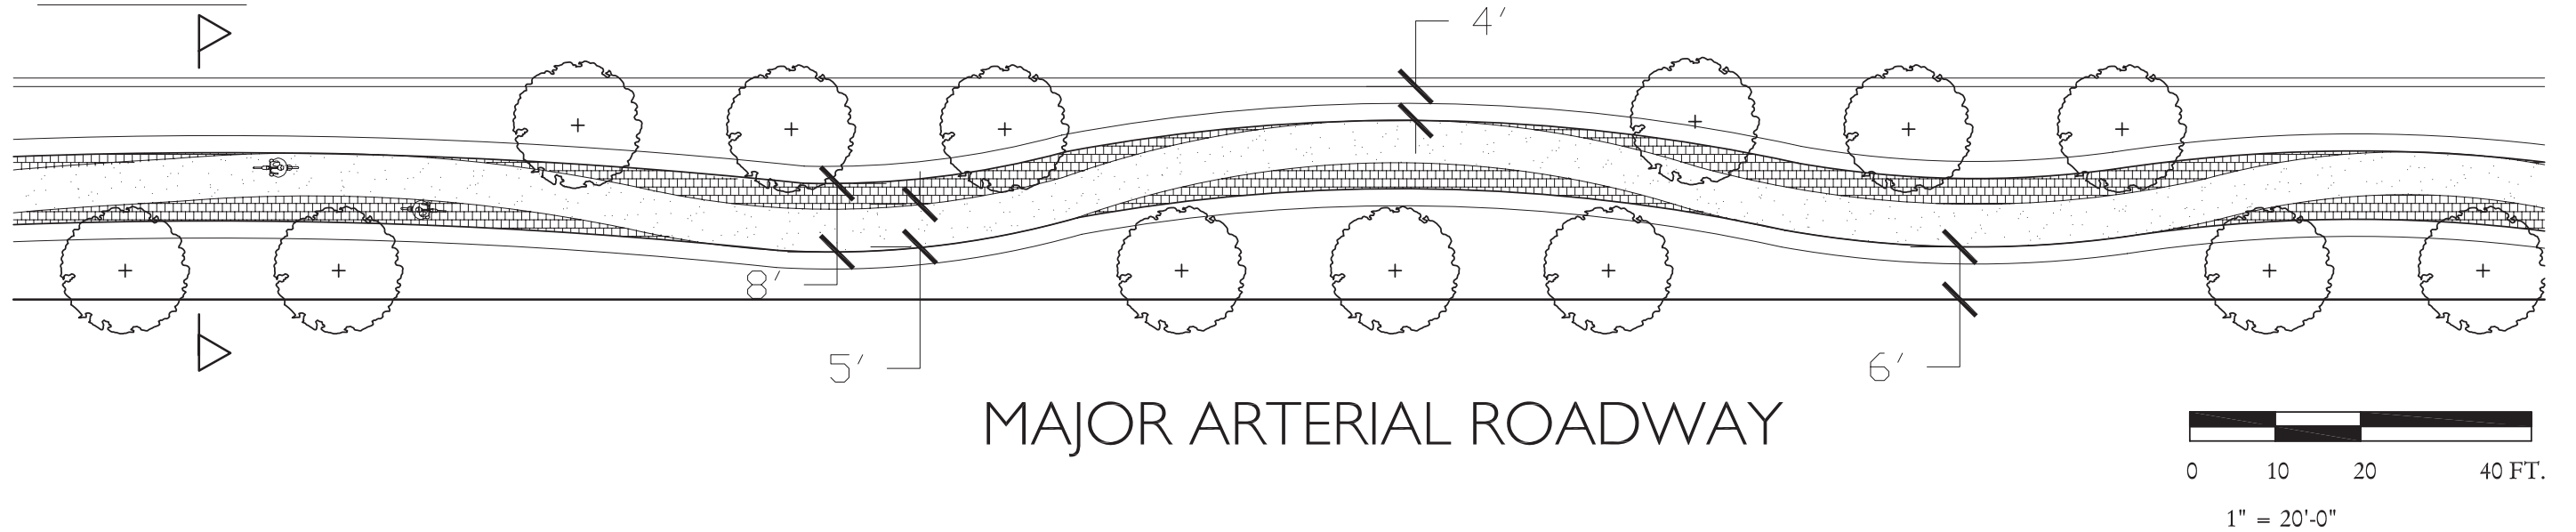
ROADSIDE BIKEWAY - TYPICAL SECTION B
